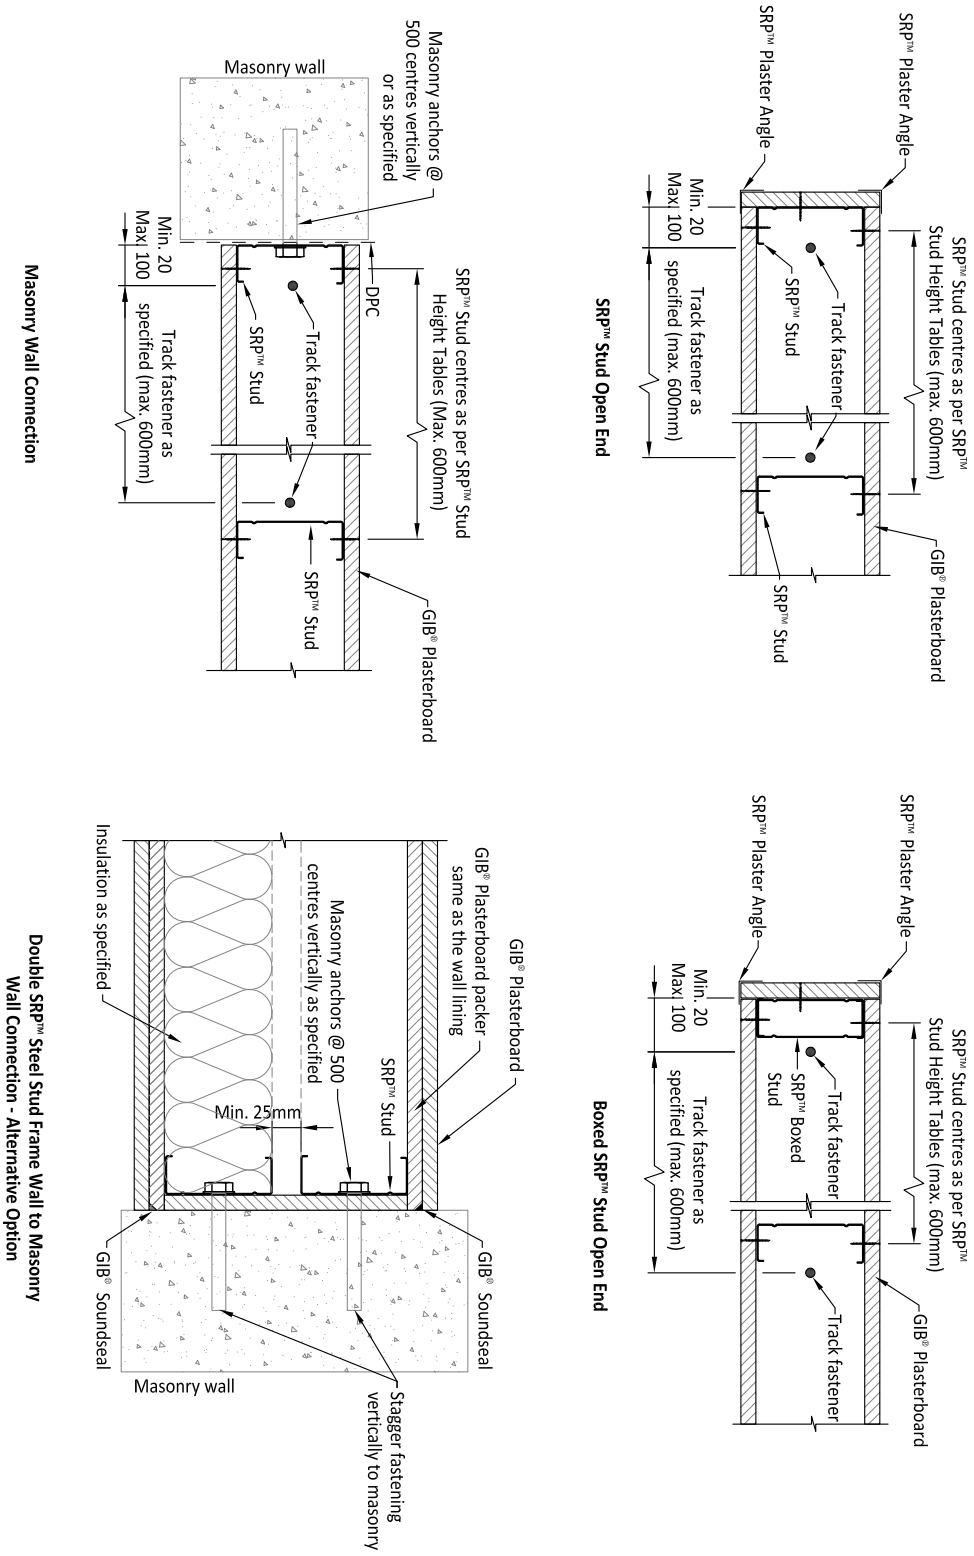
PART 1 | Standard SRP™ Whisperwall™ Stud Connections – Corners and Intersections
